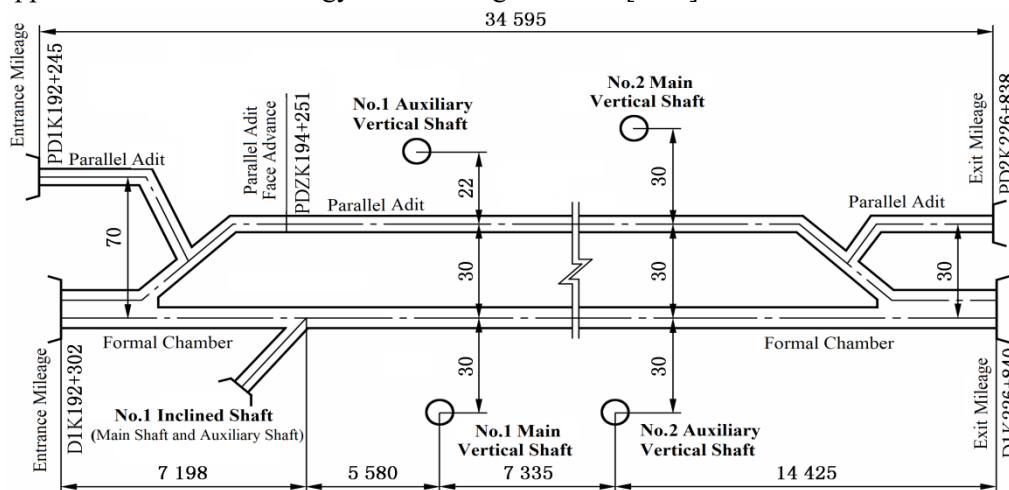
Plane diagram of the first phase construction of Gaoligong Mountain Tunnel(unit: m)
